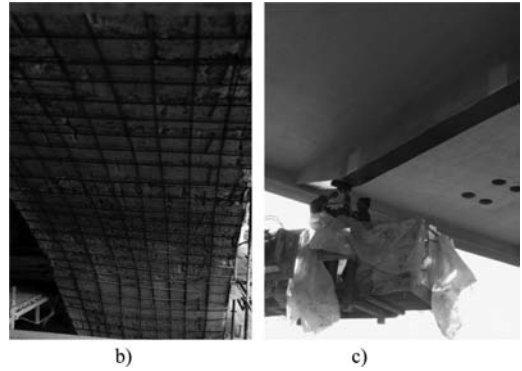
b) insertion of additional bars and preparation of the surface of the arches of the Segna Bridge c) application of FRP strips to the intrados of cross beam of the Albaredo Bridge.
